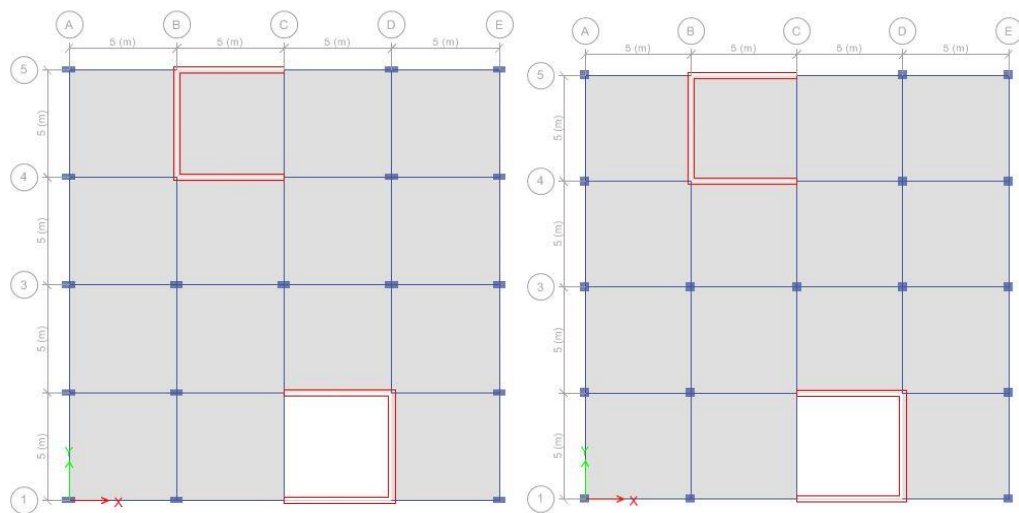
(PLAN OF BUILDING WITH RECTANGULAR AND SQUARE COLUMNS)
